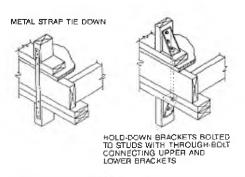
The anchoring of uplift forces is handled with metal straps or hold-down bolts (SECBC 1997).
